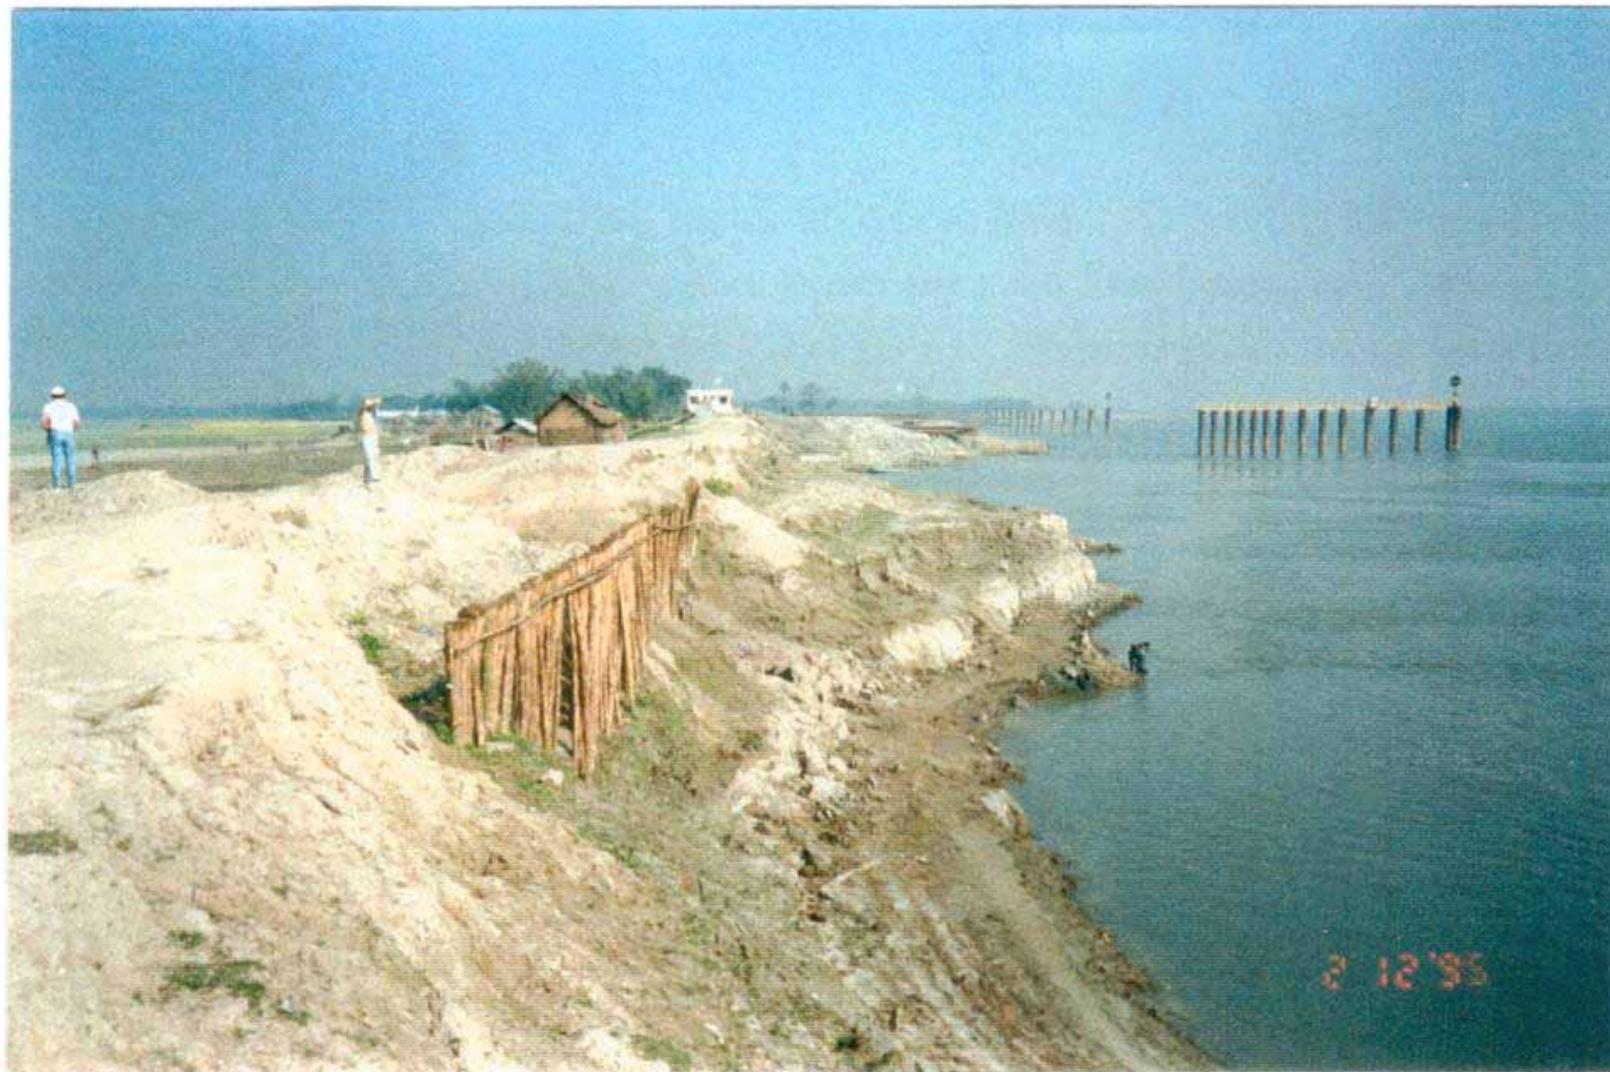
Remnants of groyne G-2 (view from downstream) and erosion of main embankment d/s of groyne G-2
